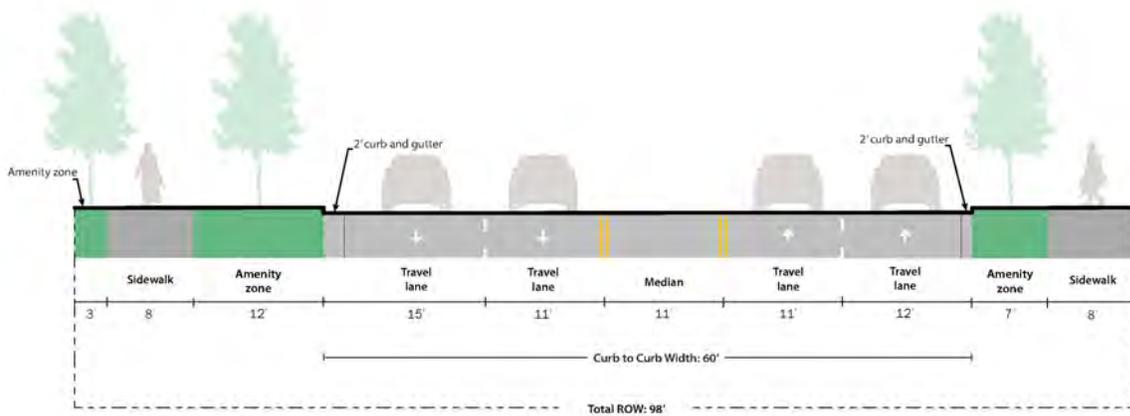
Section G (72nd Avenue West of Newton Street – Looking East)
